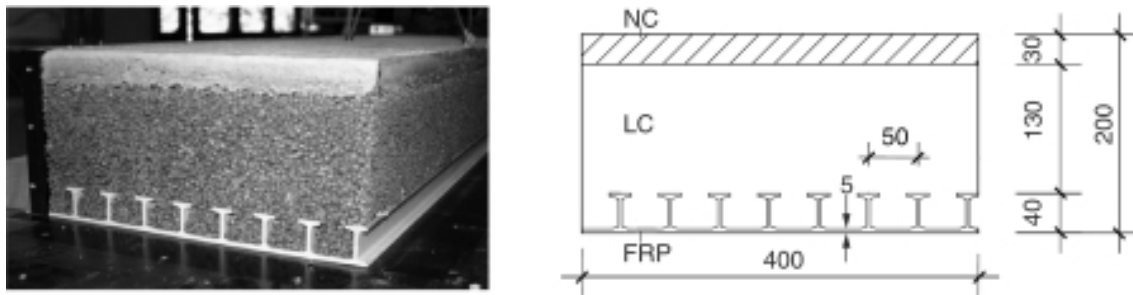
Cross-section of a hybrid GFRP–concrete sandwich panel [59].
